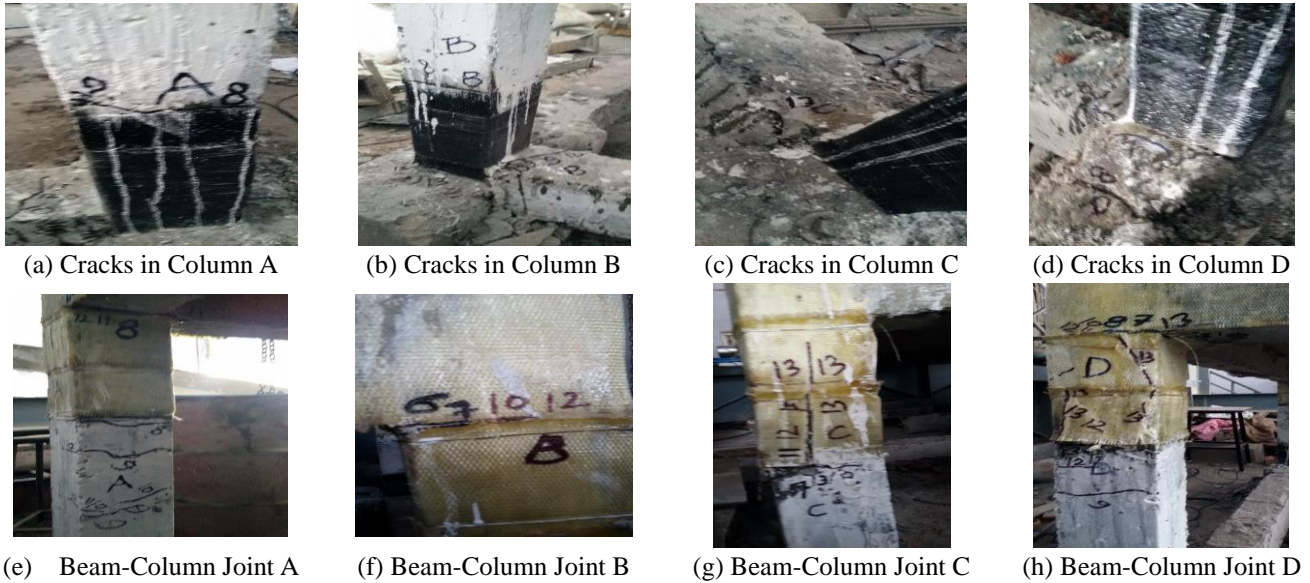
Damage in Column-Beam and Column-Foundation after loading in retrofitted frame
